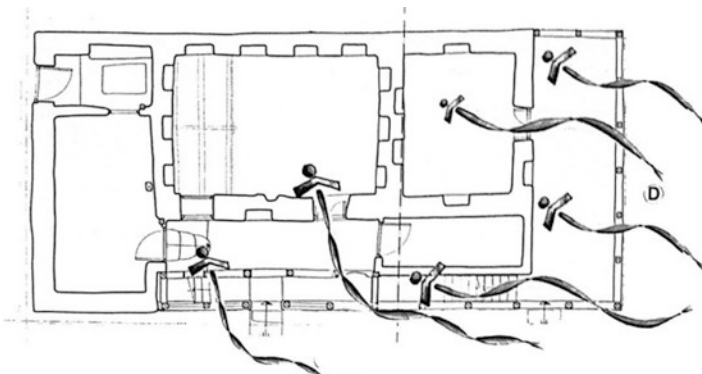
Natural ventilation in plan, Mousazadeh house (Taleghani 2011a)
